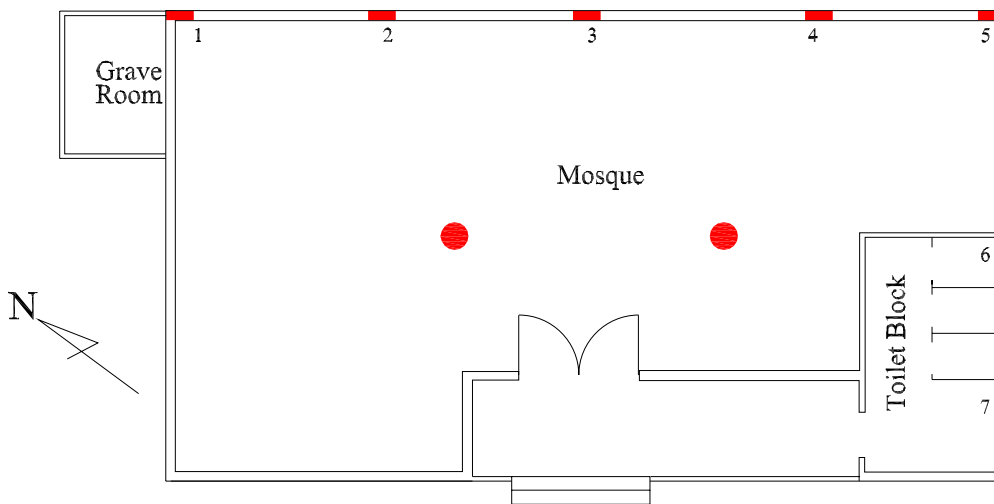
Old Part Ground Floor Plan (Case 5).
